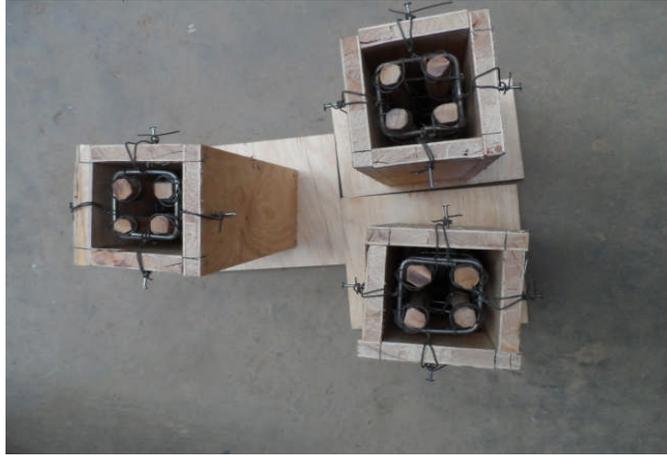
Reinforcements Suspended by Steel Rebar Ties Inside the Formworks
